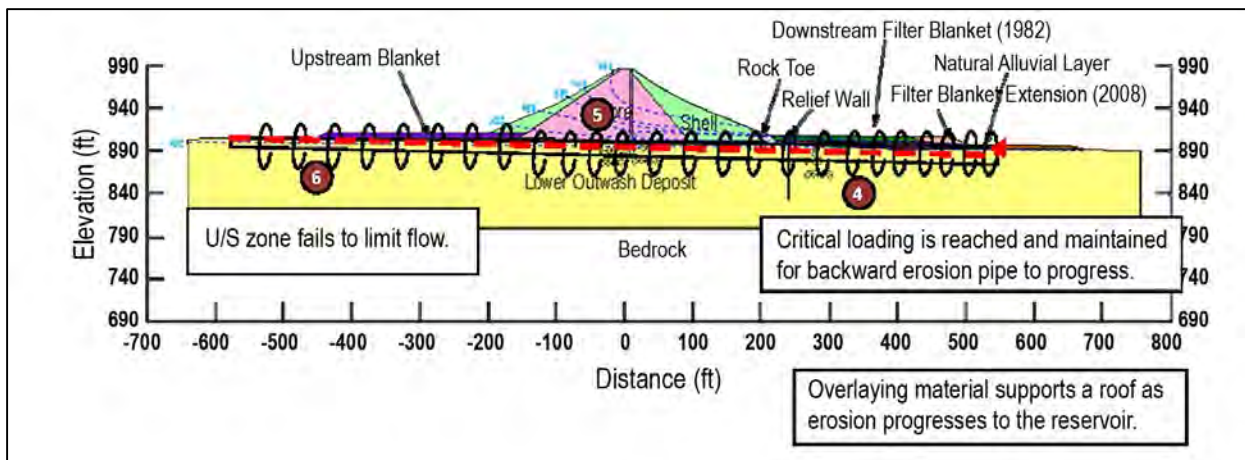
Example PFM: Stages 4, 5, and 6 of a “through foundation” failure mode.
